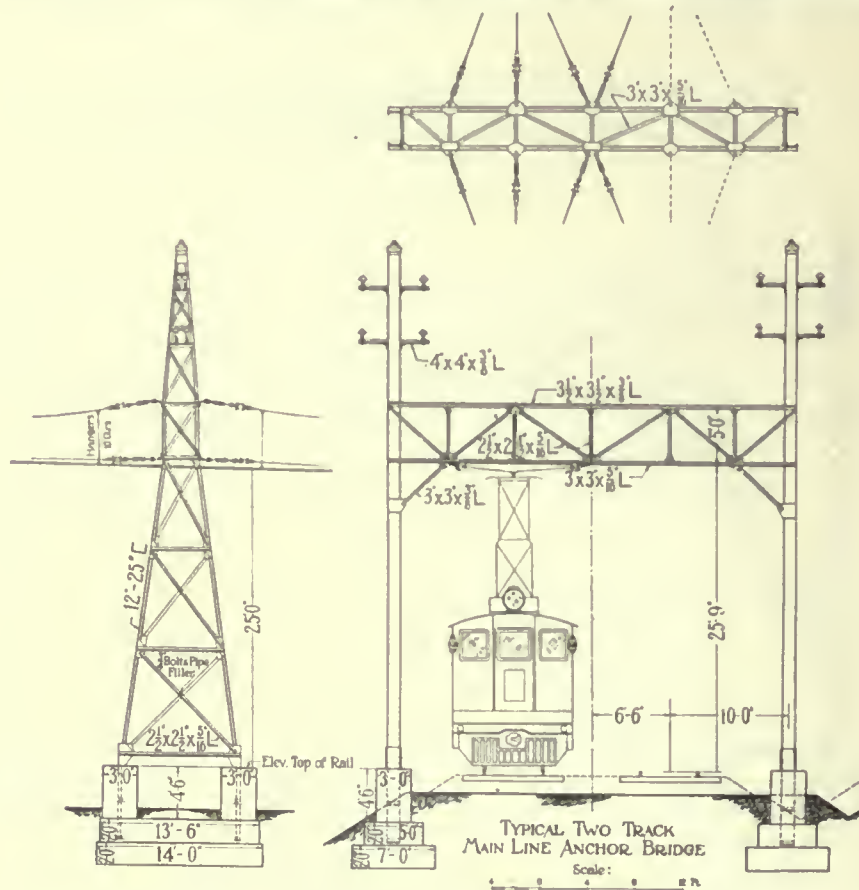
TYPICAL TWO TRACK ANCHOR BRIDGE
